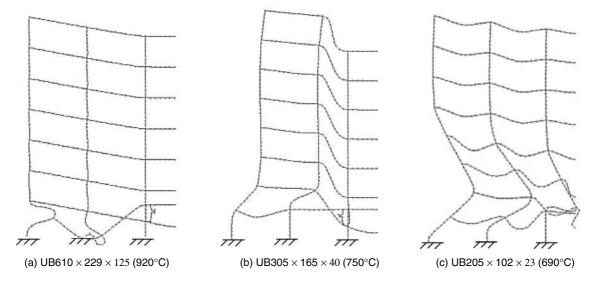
Collapse mechanisms of steel frames in Fire 1 with different beam sections
